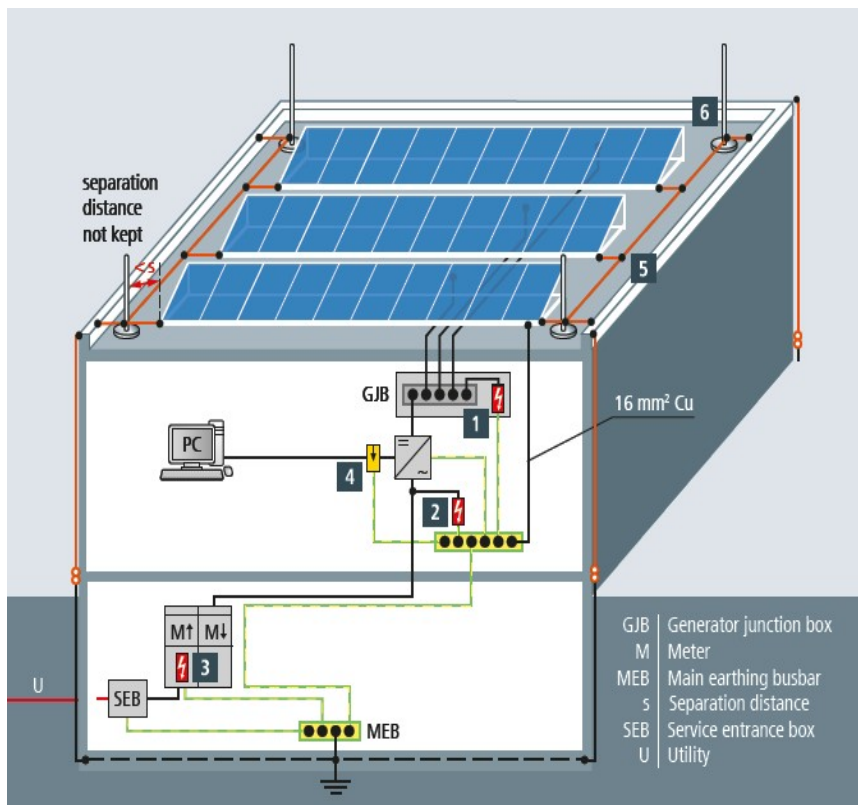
Installation of a rooftop PV system with a LPS (ample roof space)
